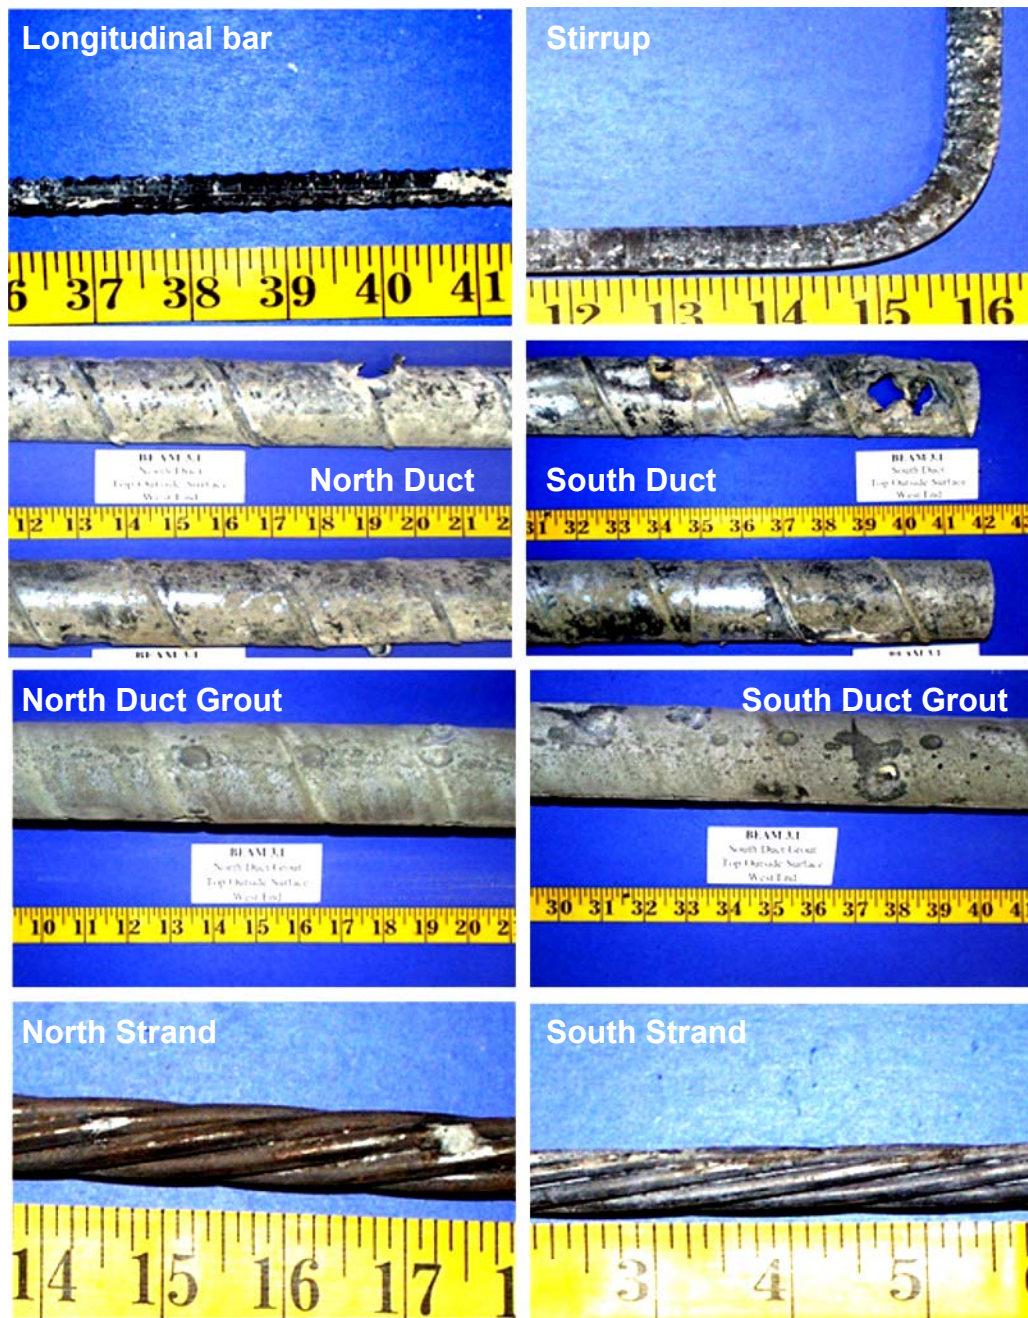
Specimen 3.1 – Reinforcing Elements
